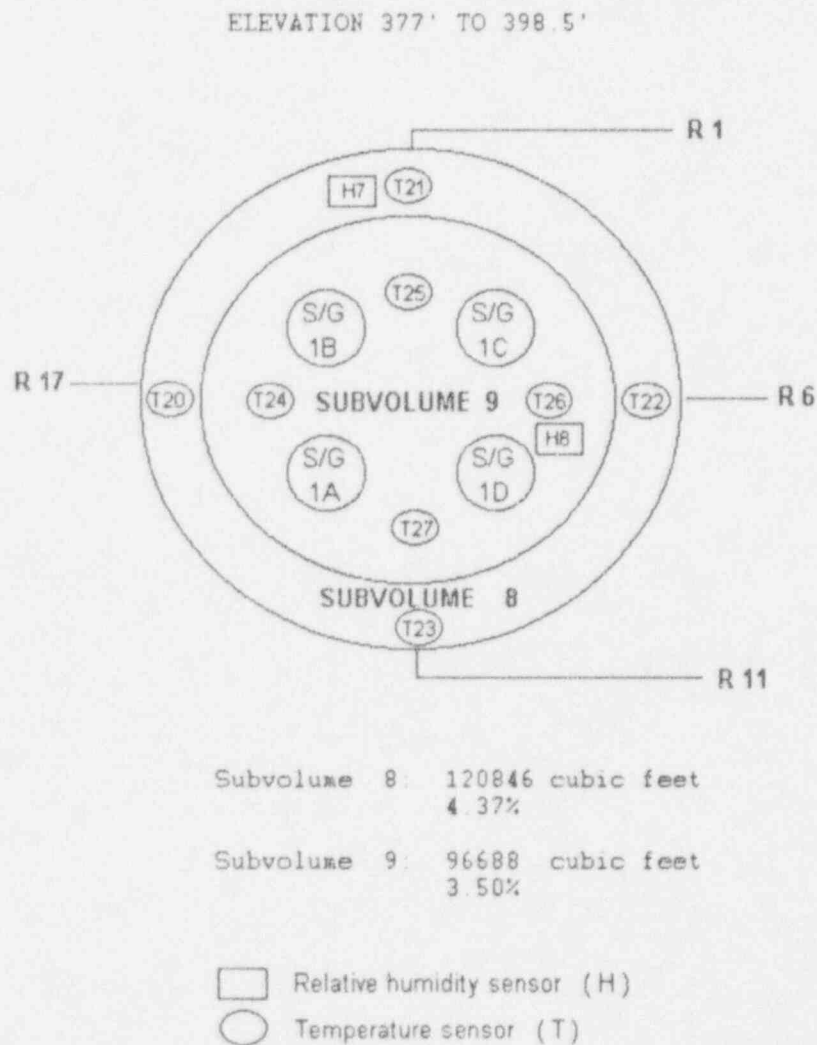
Containment building sensor placement and subvolume identification from elevation 377' to 398.5.
